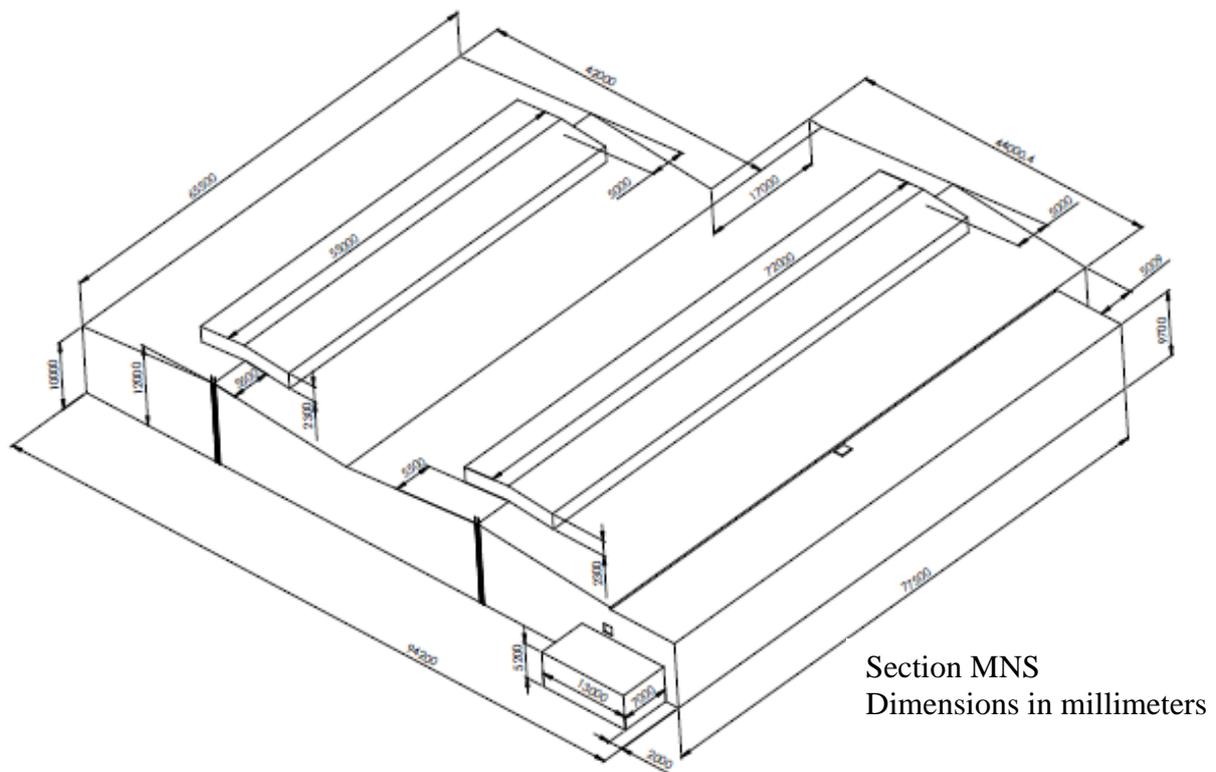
Rolling Stock Repair and Operation Section in Sochaczew - view of the Inspection and Repair Room building structure.
